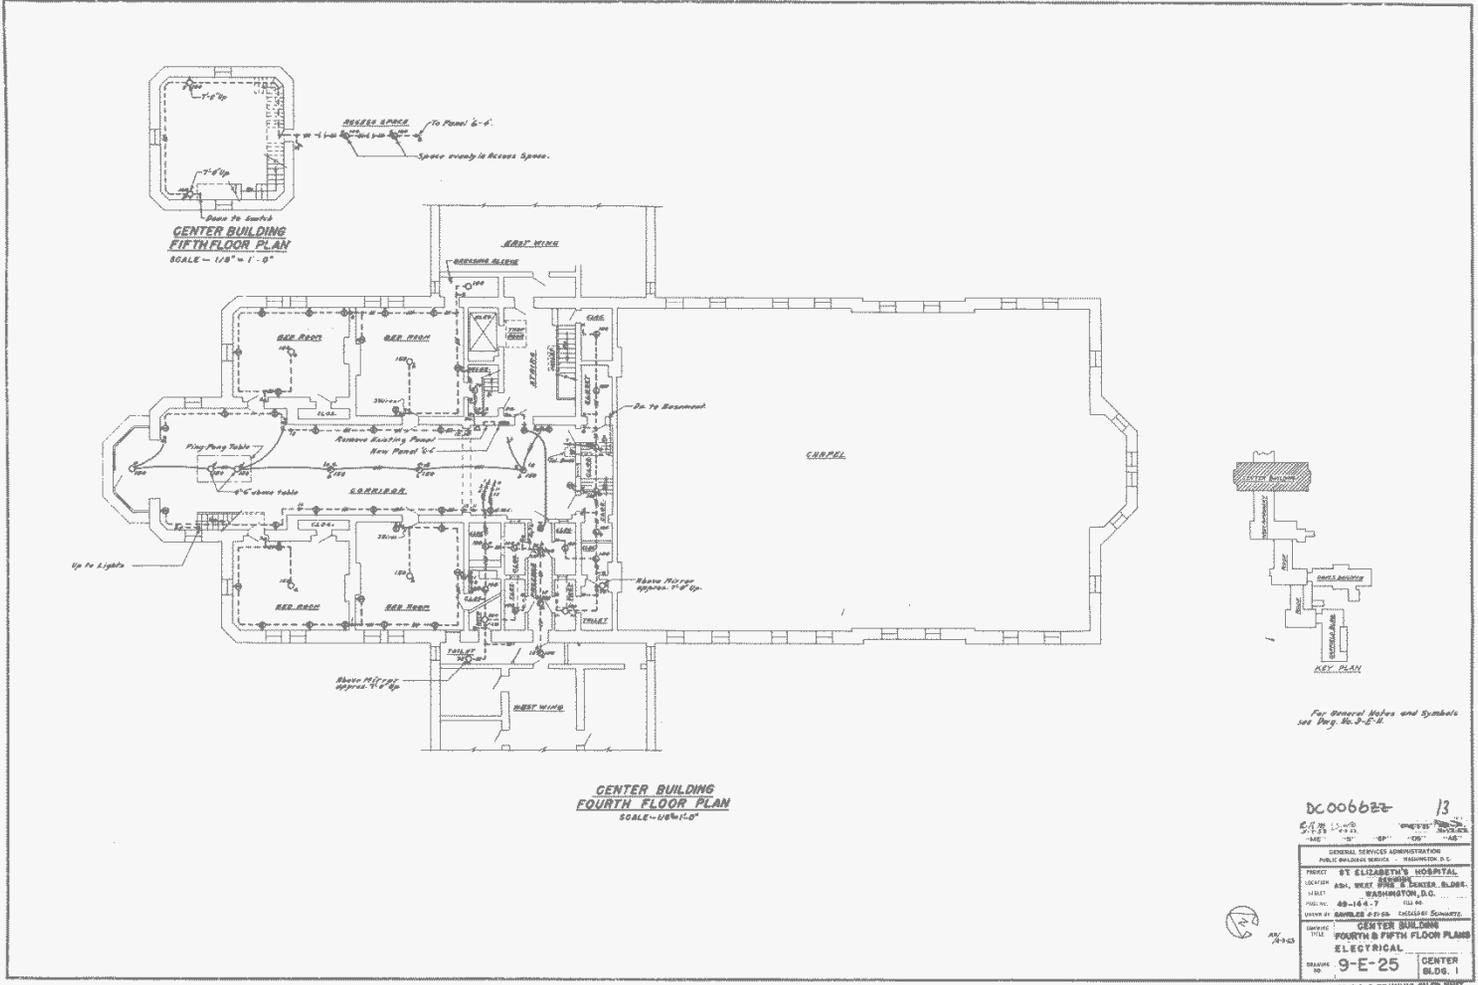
Fourth floor plan of the Center Building outlining improvements to the electrical system, 1953. Source: GSA archives, image DC0066SE0013.
